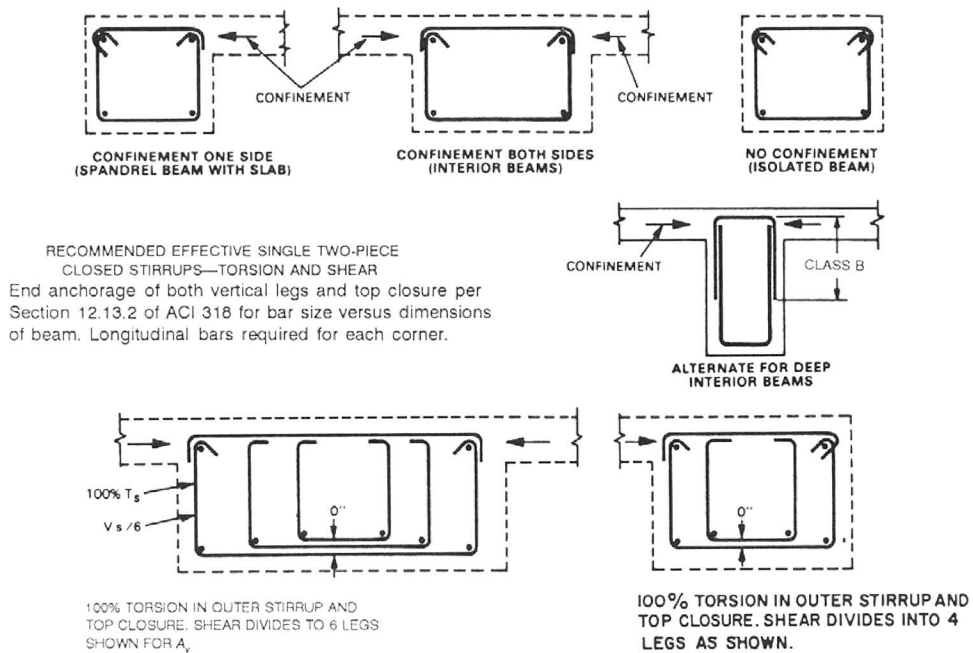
Recommended two-piece closed single and multiple U-stirrups for members subjected to torsion (ACI Committee 315 2004).
